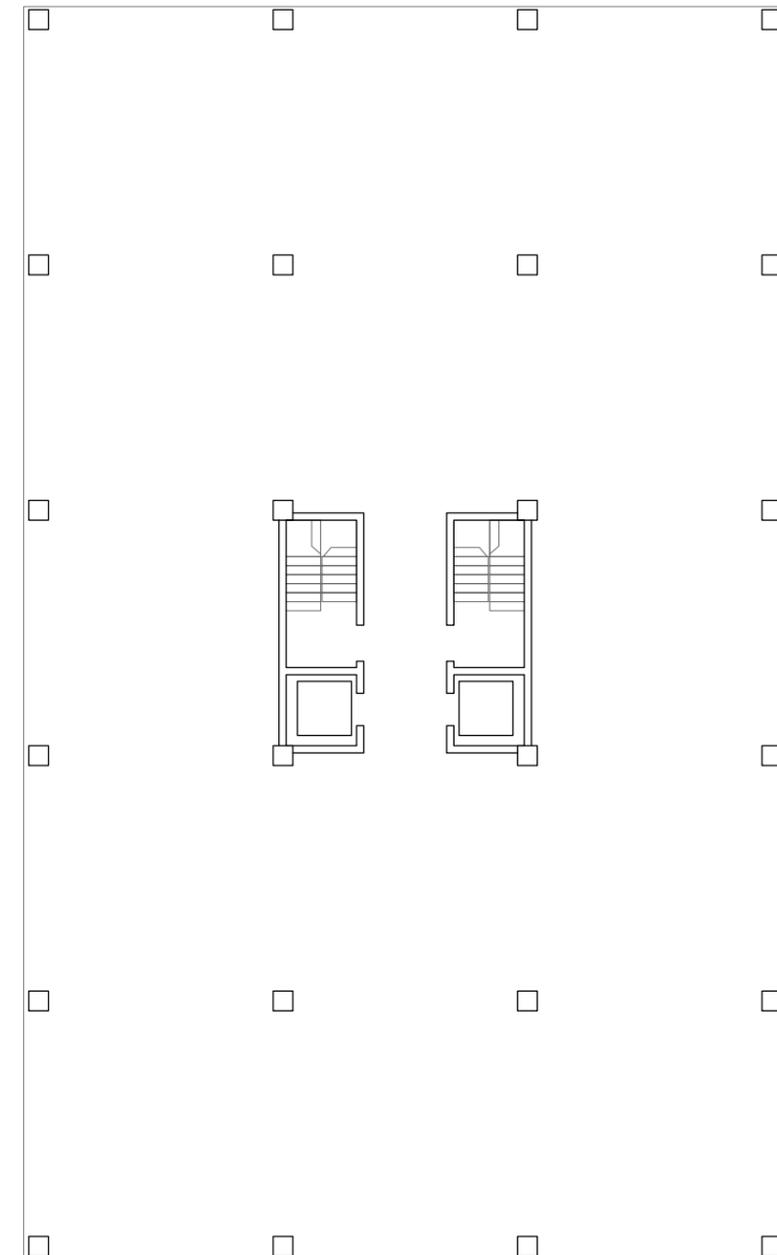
Author. 860-880 Lake Shore Drive Apartment Floor Plan. 2022.
